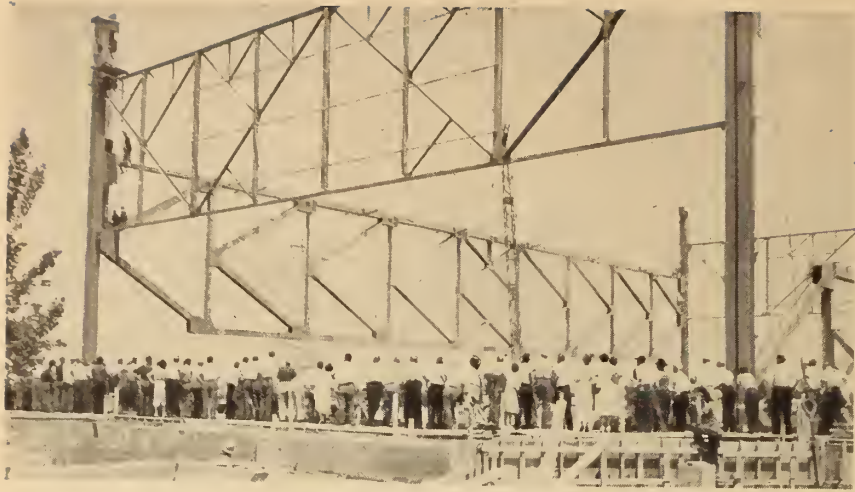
On the way up; note the top column extension and guys, and the 115-foot trusses in place.
